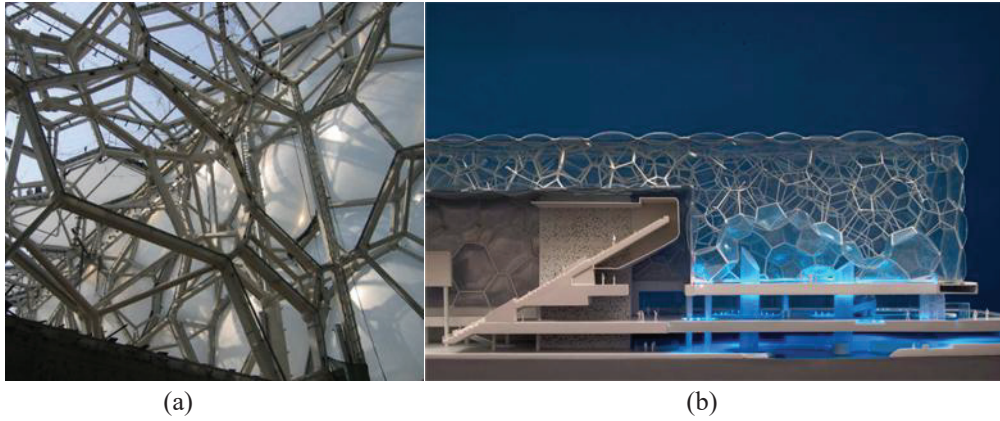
(a) Steel beam, node detail (URL-3), (b) Water Cube structural section (URL-6)
